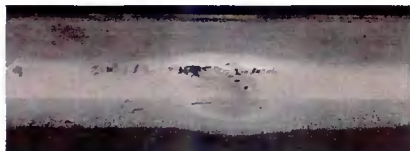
Typical examples of surface rail defects initiated and aggravated by high wheel-rail contact stresses. C — Wheel burn cracks caused by the slipping of a wheel axle.
